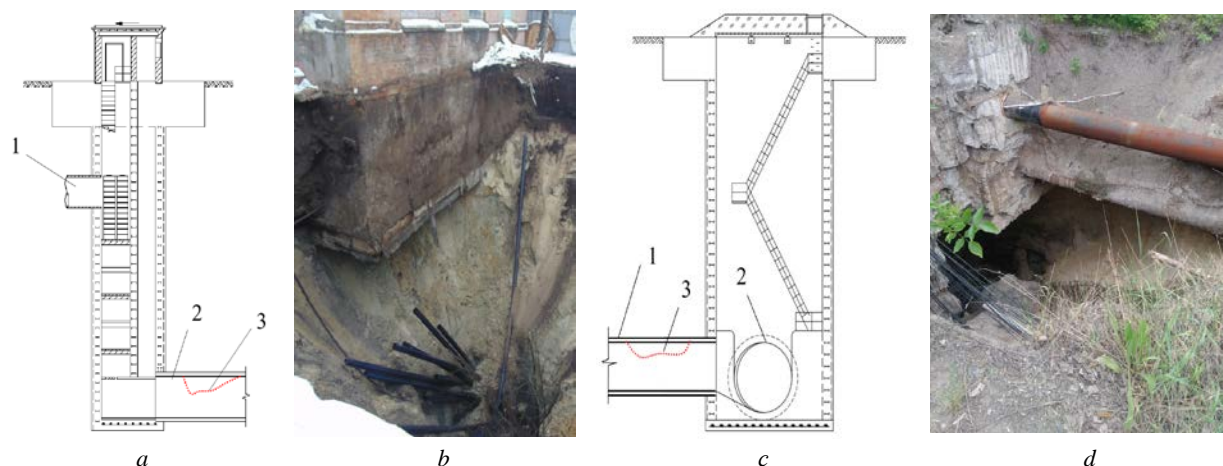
Emergency failure of the sewer tunnel on Grekovskaya street (Kharkiv, Ukraine, 2017):
